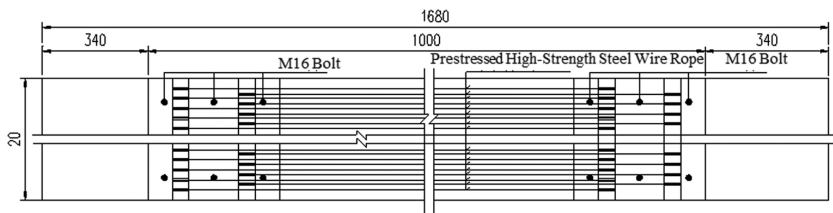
Bottom view of the arrangement on the beam (unite: cm)
